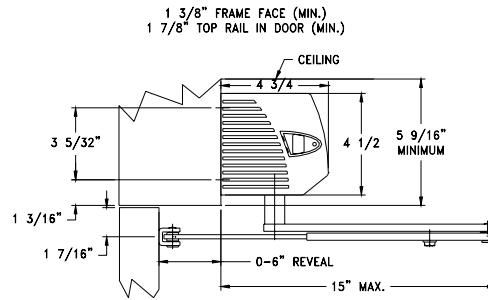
OPERATOR CLEARANCES – PUSH ARM
